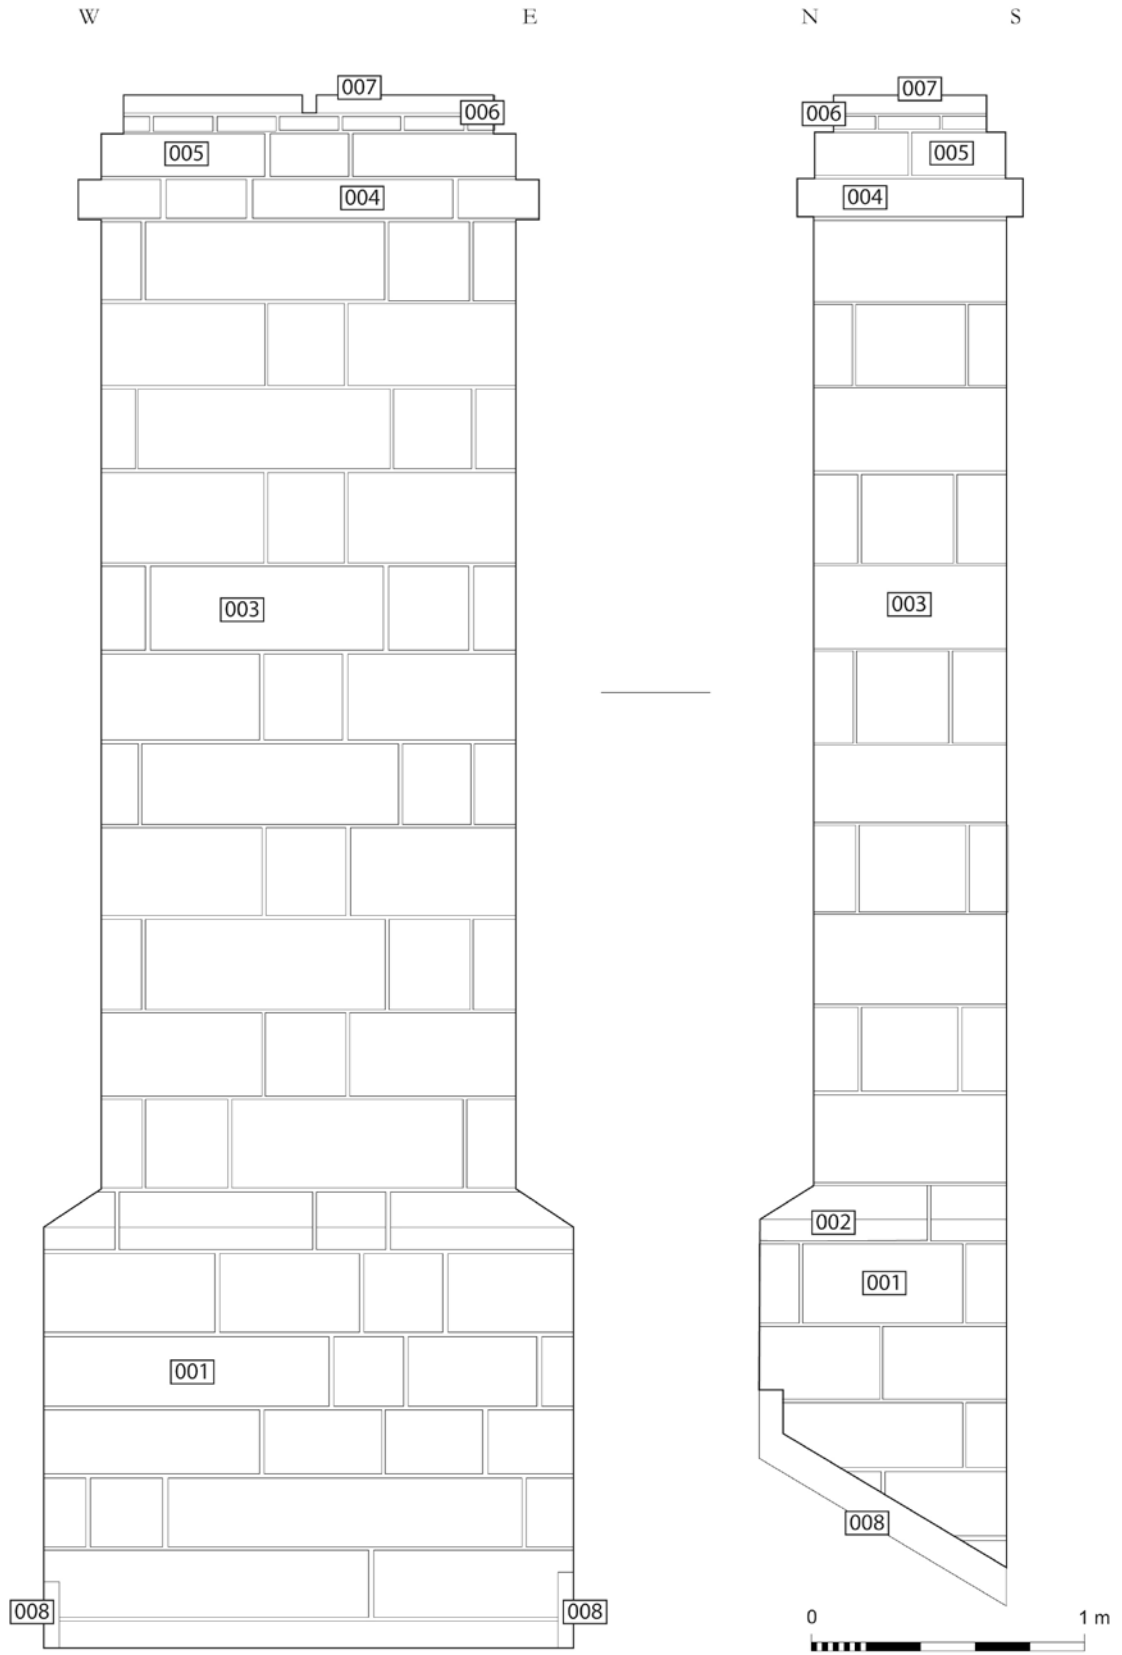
Chimney RC12, southern elevation (left), and western elevation.
